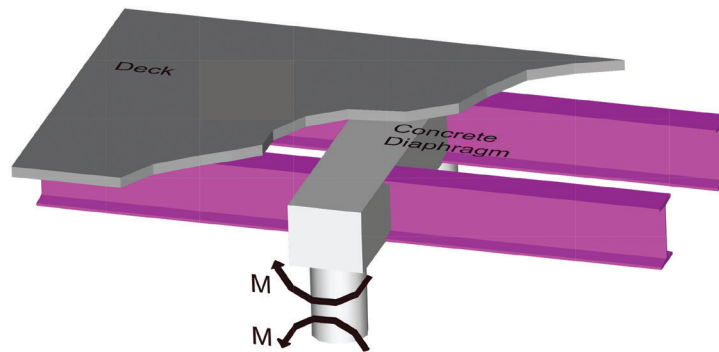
Transfer column moment to the concrete diaphragm through an integral connection.
